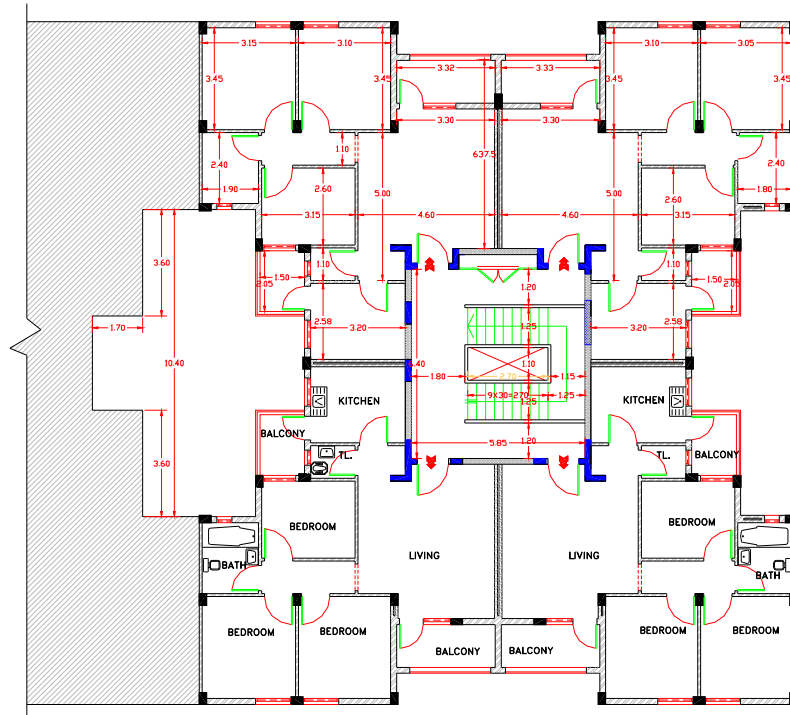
Typical floor plan for typical building at El-Nada housing project
